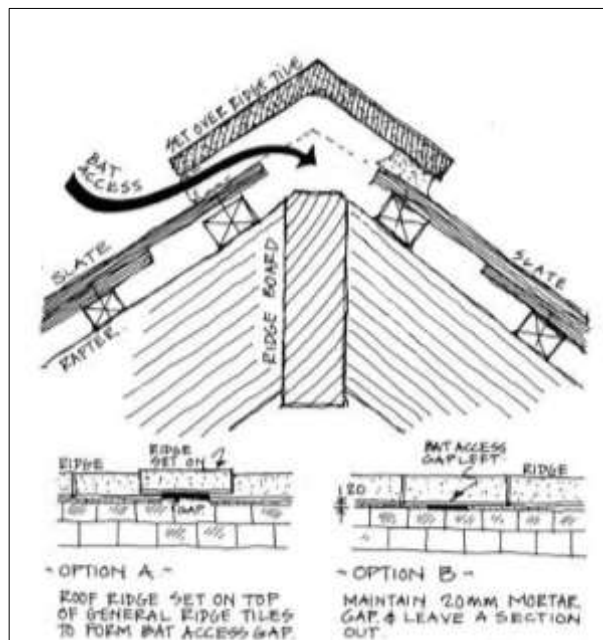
Gaps will be left to enable bat access under 2x ridge tiles. This can be achieved through one of two options (A or B). Access into the new roost spaces will be provided on one side only. The side of access should vary between each raised ridge tile to give a variety of options for bats.
